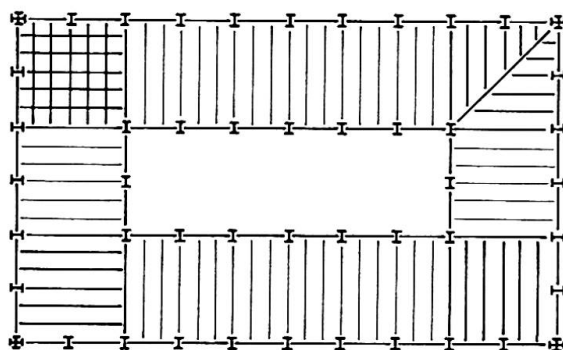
Typical Plan Showing Various Possible Corner Framings
